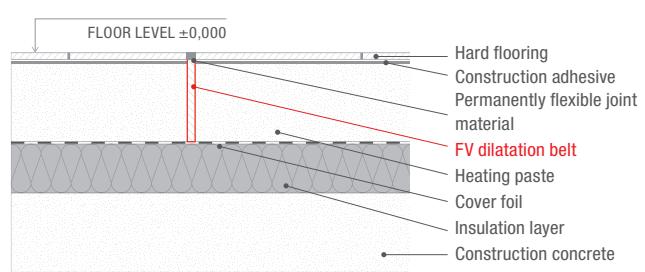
Heating paste dilatation belt when laying hard flooring with division layer (floor tiling, stone floor, laminate floor)
